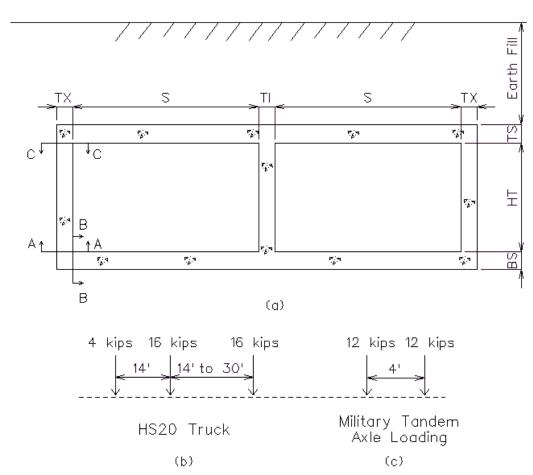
Typical cross section of double box culvert (a) dimensions (b) one wheel line of HS20 Truck (c) one wheel line of Military Tandem Axle Loading
